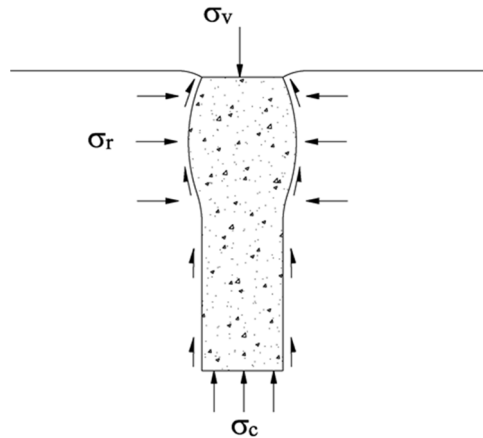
The bulging failure and stresses on a single stone column under vertical load
